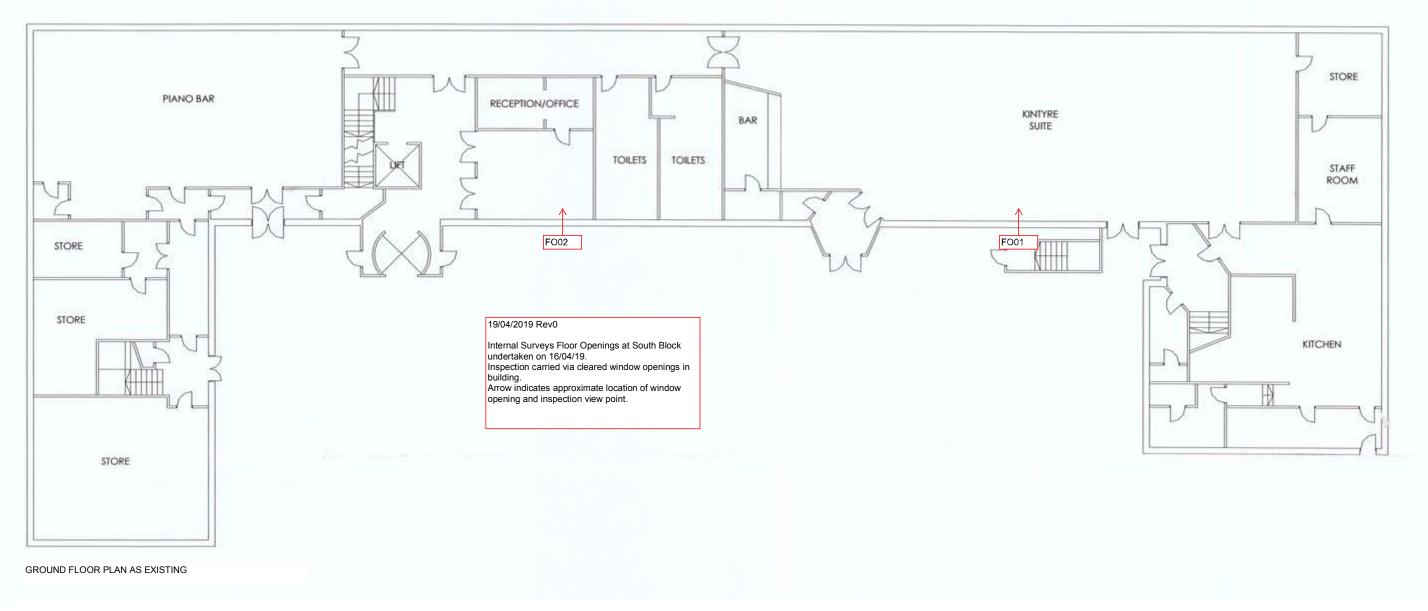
Plan of Station Hotel Building South Block Ground Floor showing Internal Survey Floor Openings Defect/Observation Locations
